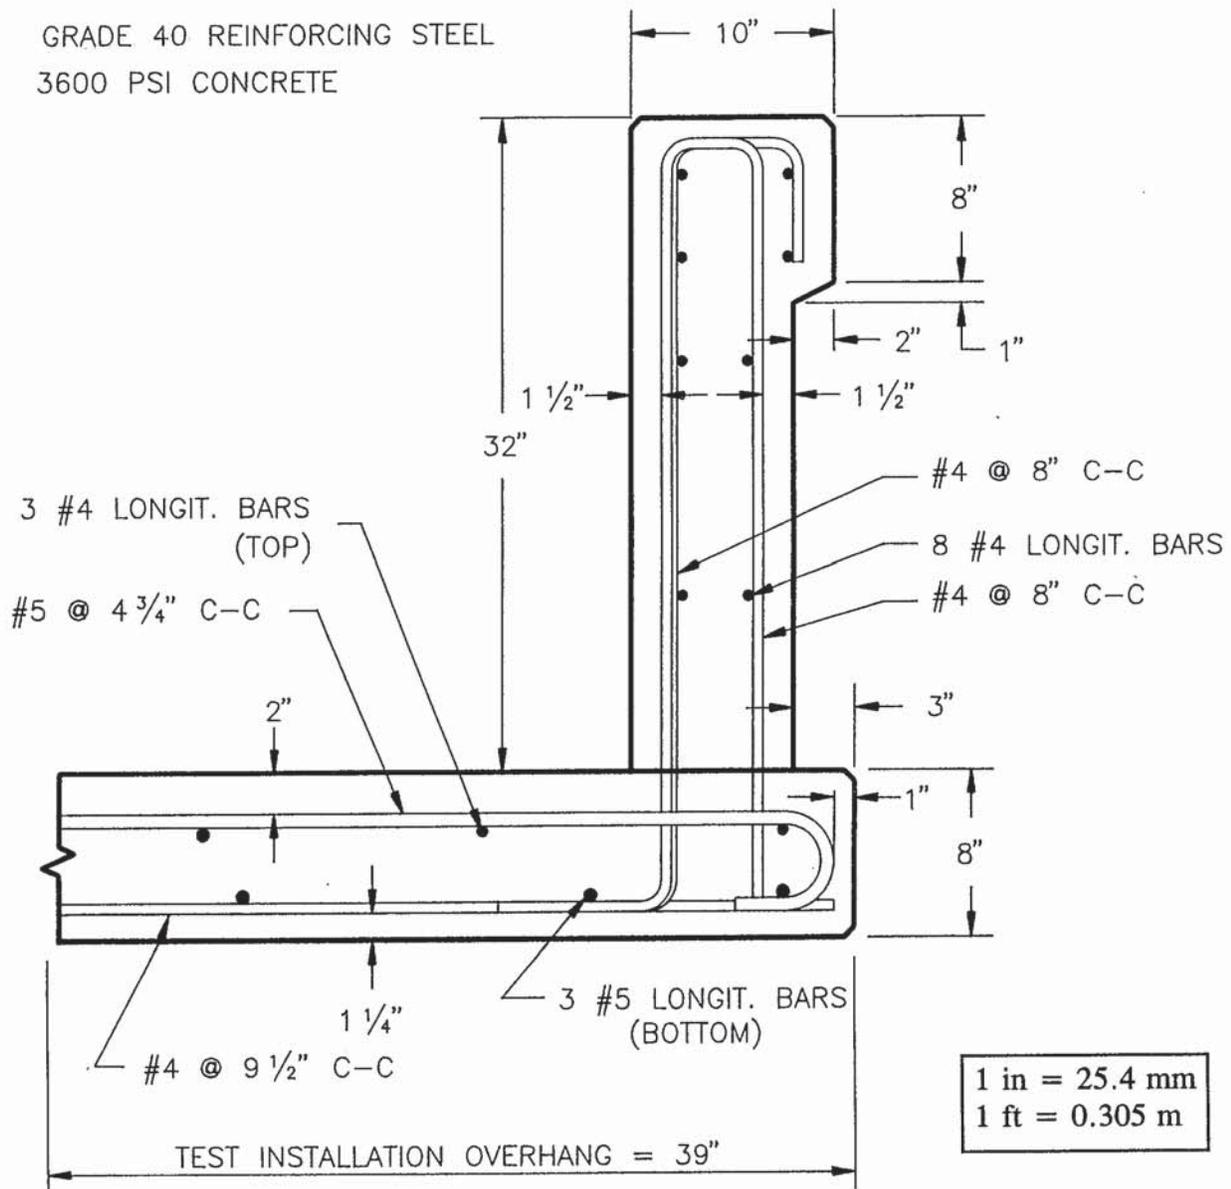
32-in (813-mm) Vertical Concrete Parapet (8,62,63,48,15).
